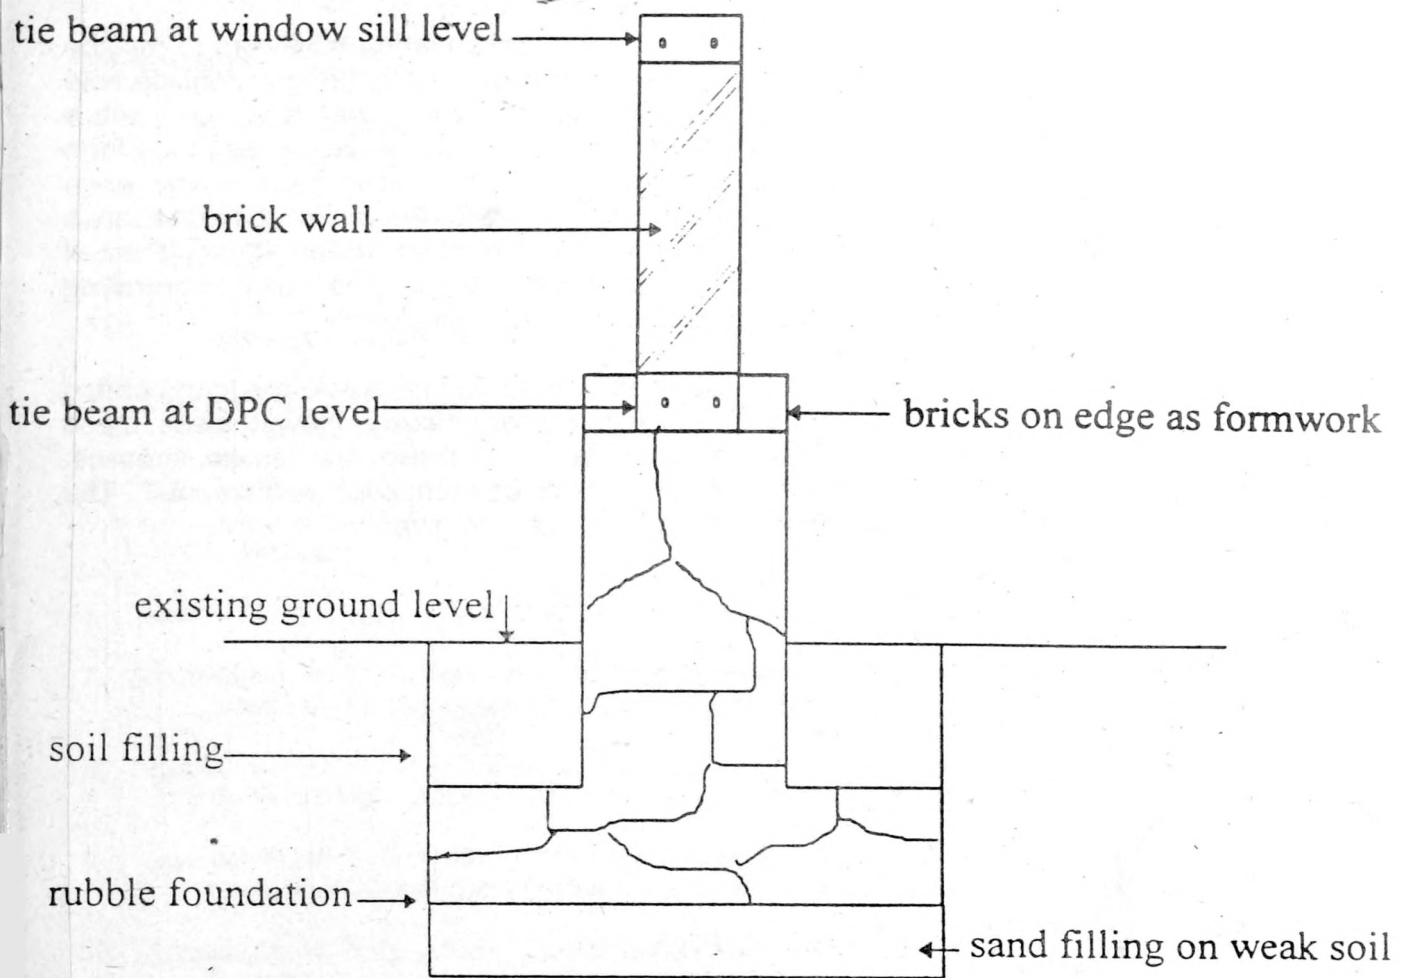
Rubble foundation with tie beams at DPC and window sill levels
